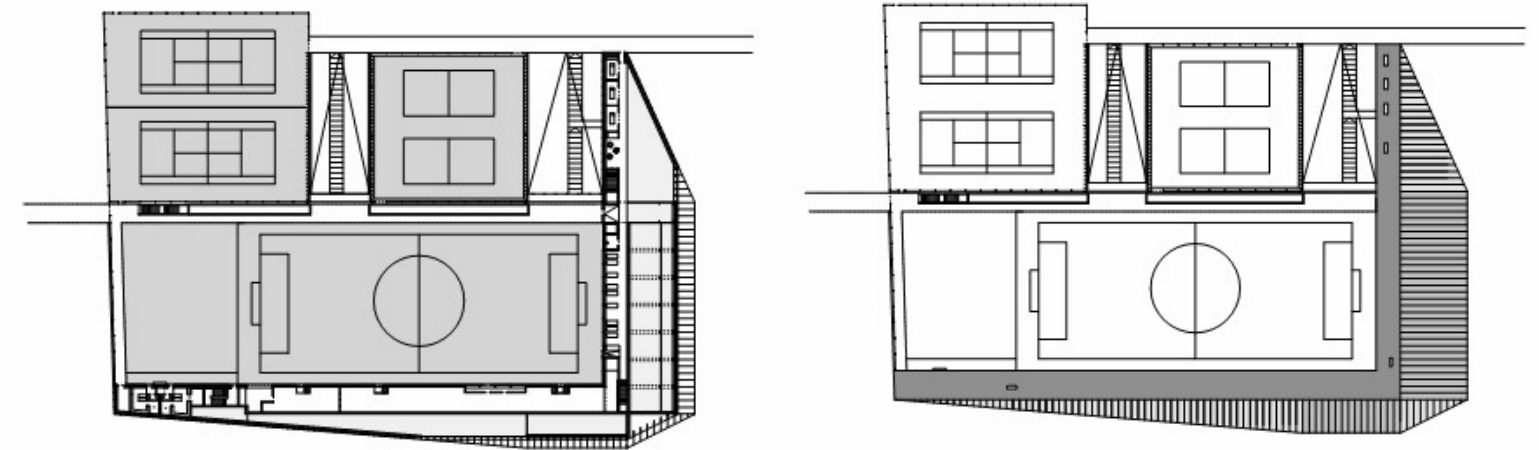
Sport Center ETH Honggerberg Plan. Source : ArchDaily
